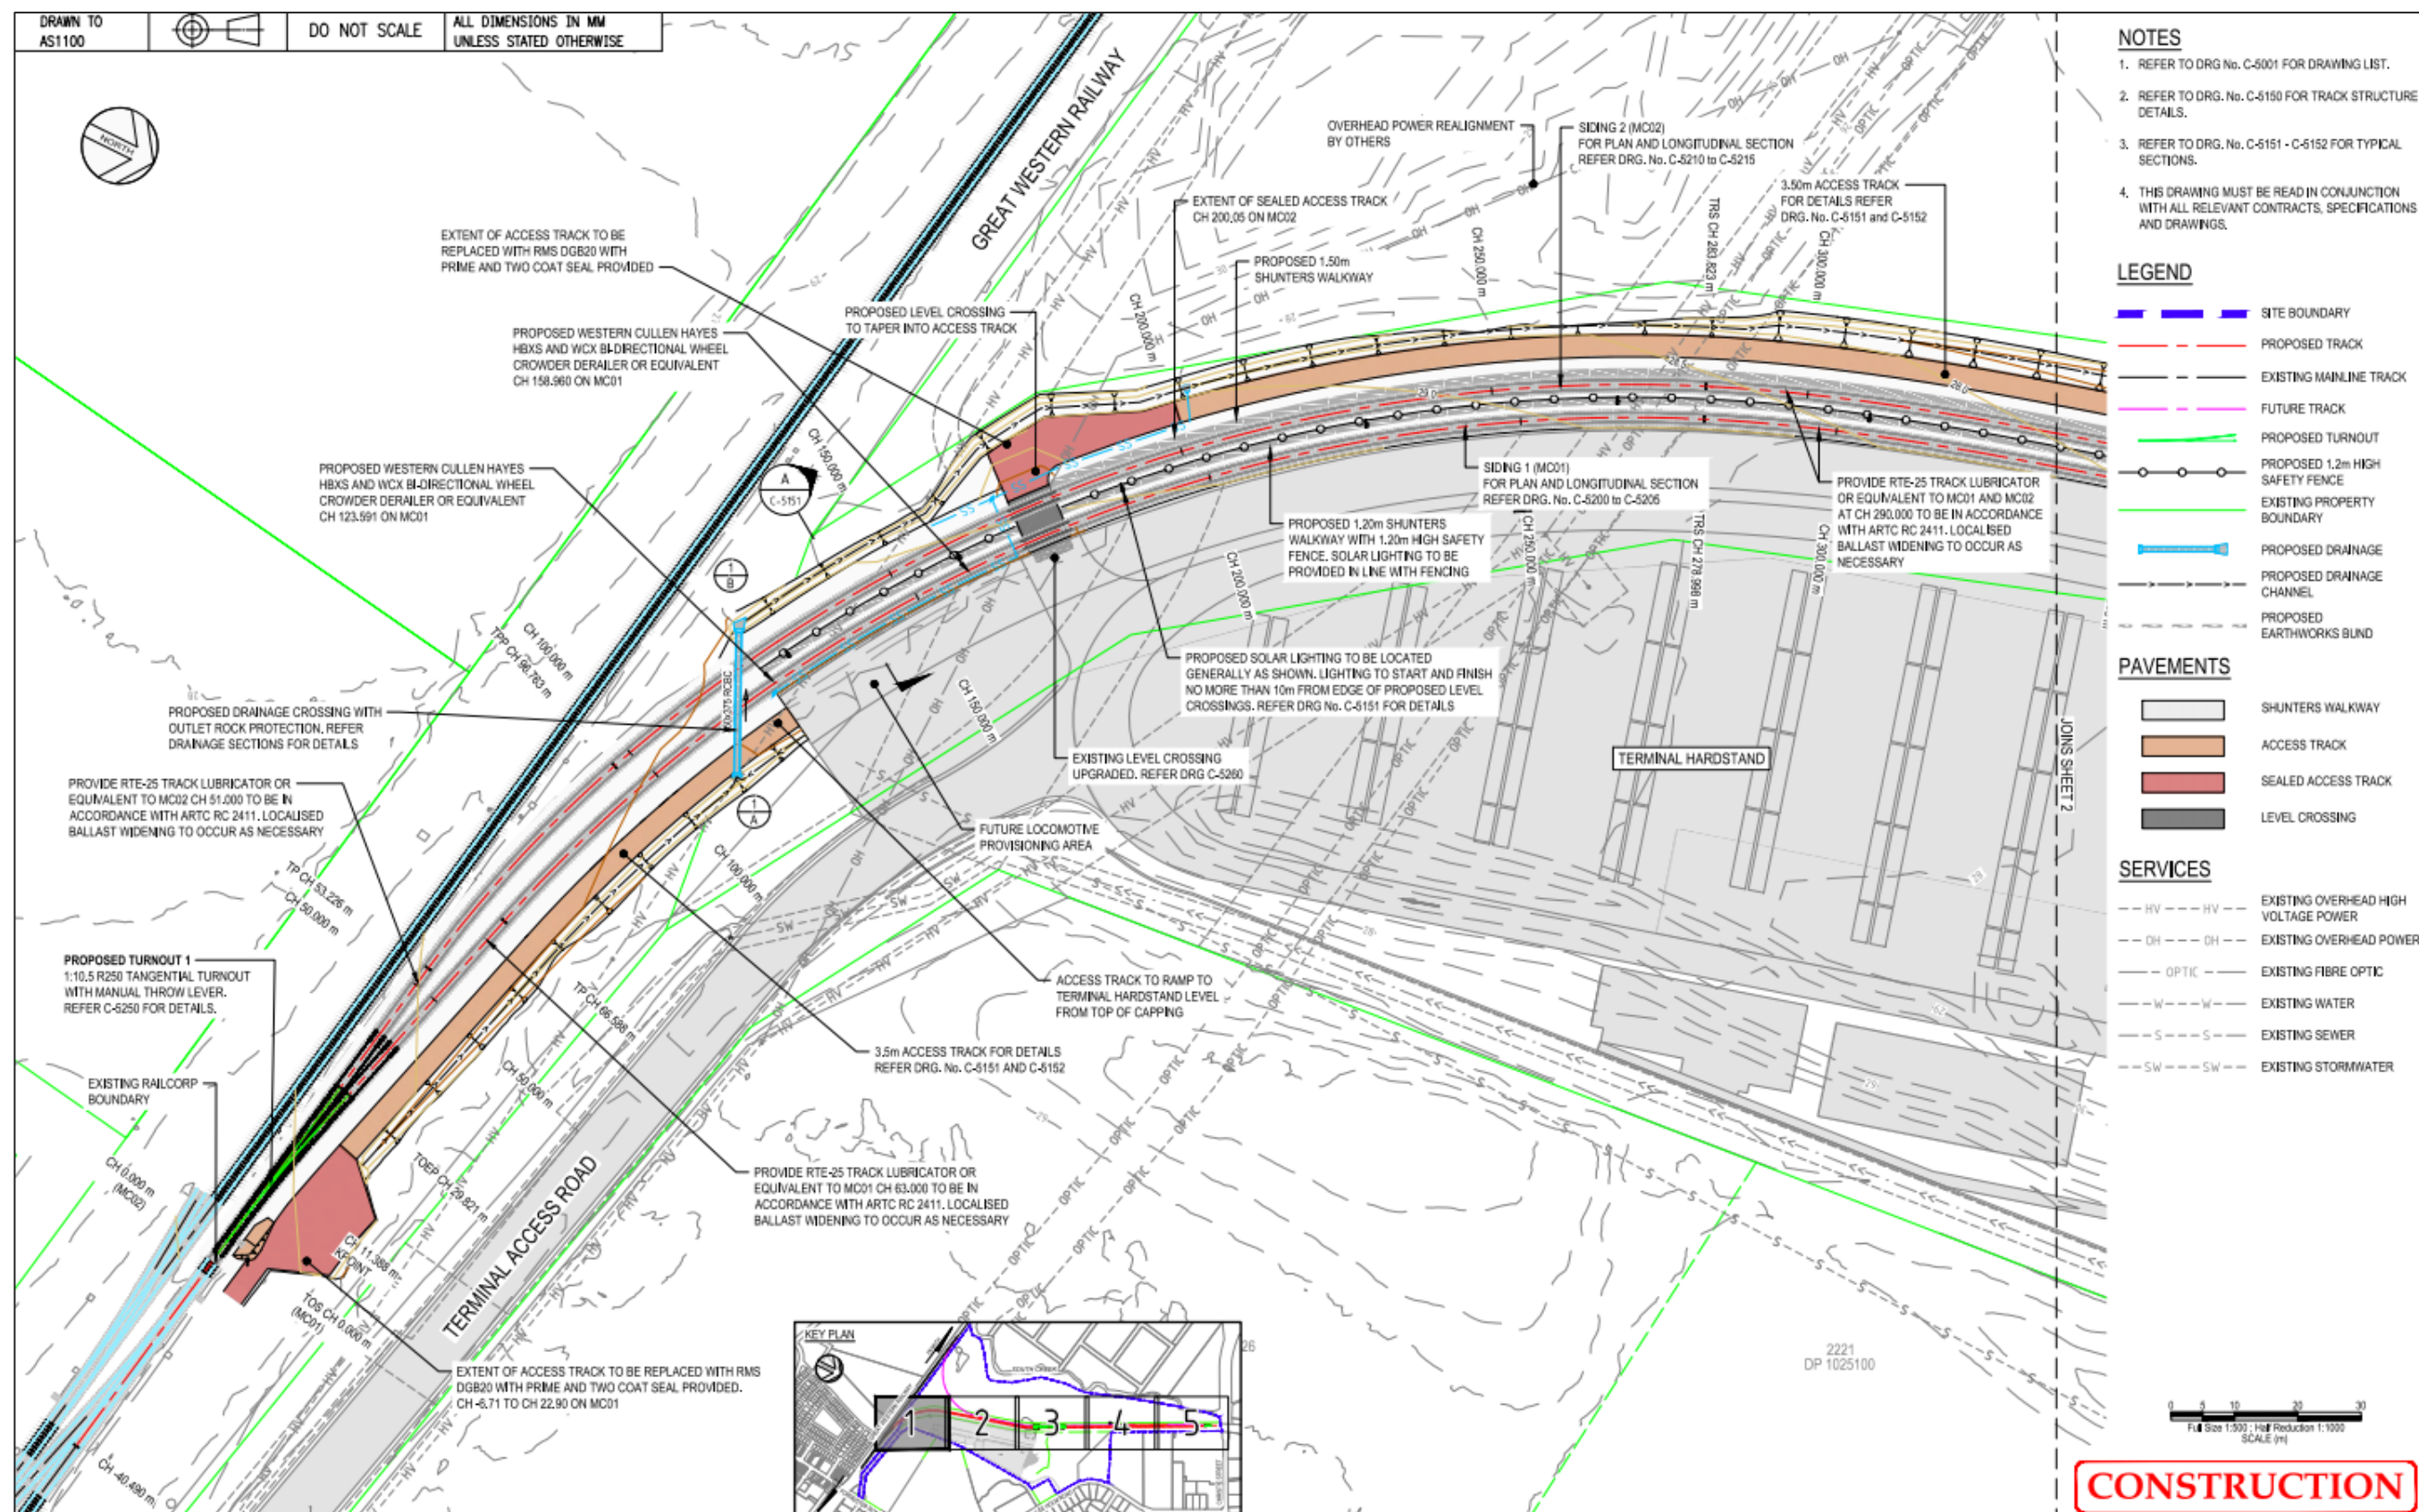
| Rail refurbishment works engineering drawings – Sheet 01 of 05 (Source: Applicant's Modification Report)
